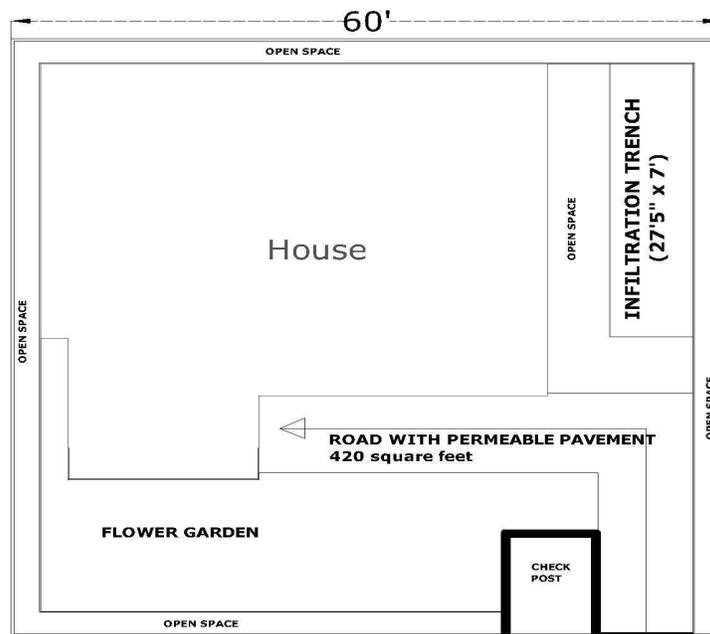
Position of Infiltration Trench and Permeable pavement in a 5 Katha Plot
